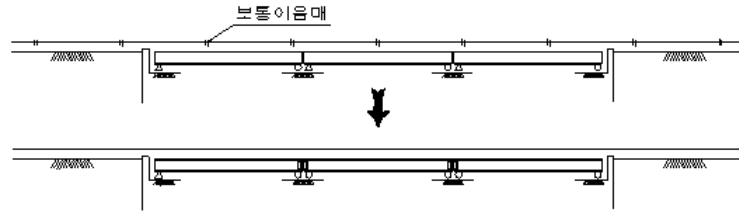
Conceptual diagram of continuing bridge girders to CWR
